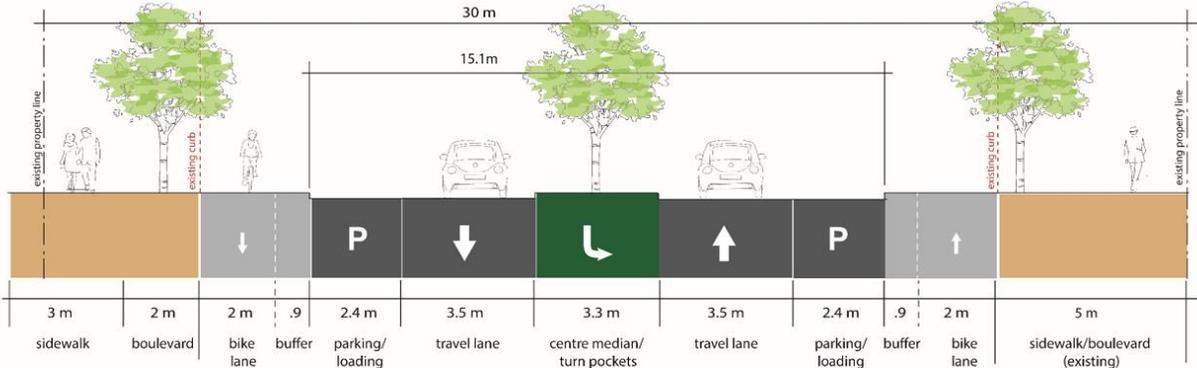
Potential cross section for upper Eighth Street (Royal to Carnarvon) looking north
